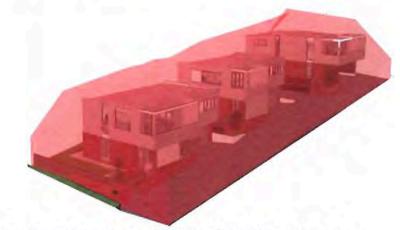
Building Envelope 3D view: Townhouse 3 L1 roof outside of permitted envelope.
